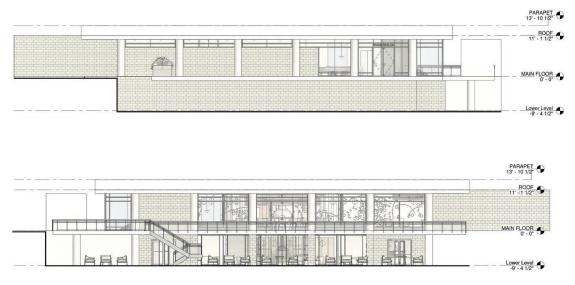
South and North exterior elevations, Peguis Pavilion. NTS
